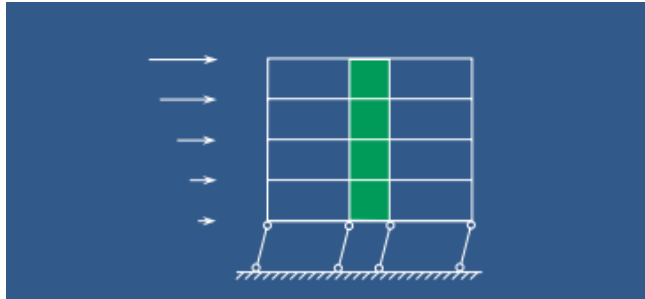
Soft Story Ground Floor [Bachmann, 2002]
